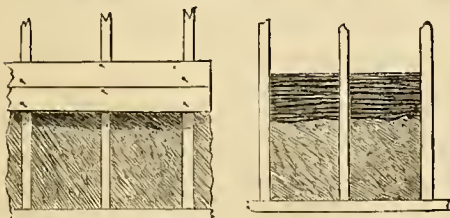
CONCRETE FILLING. Fig. 3. WATTLED WALL.
